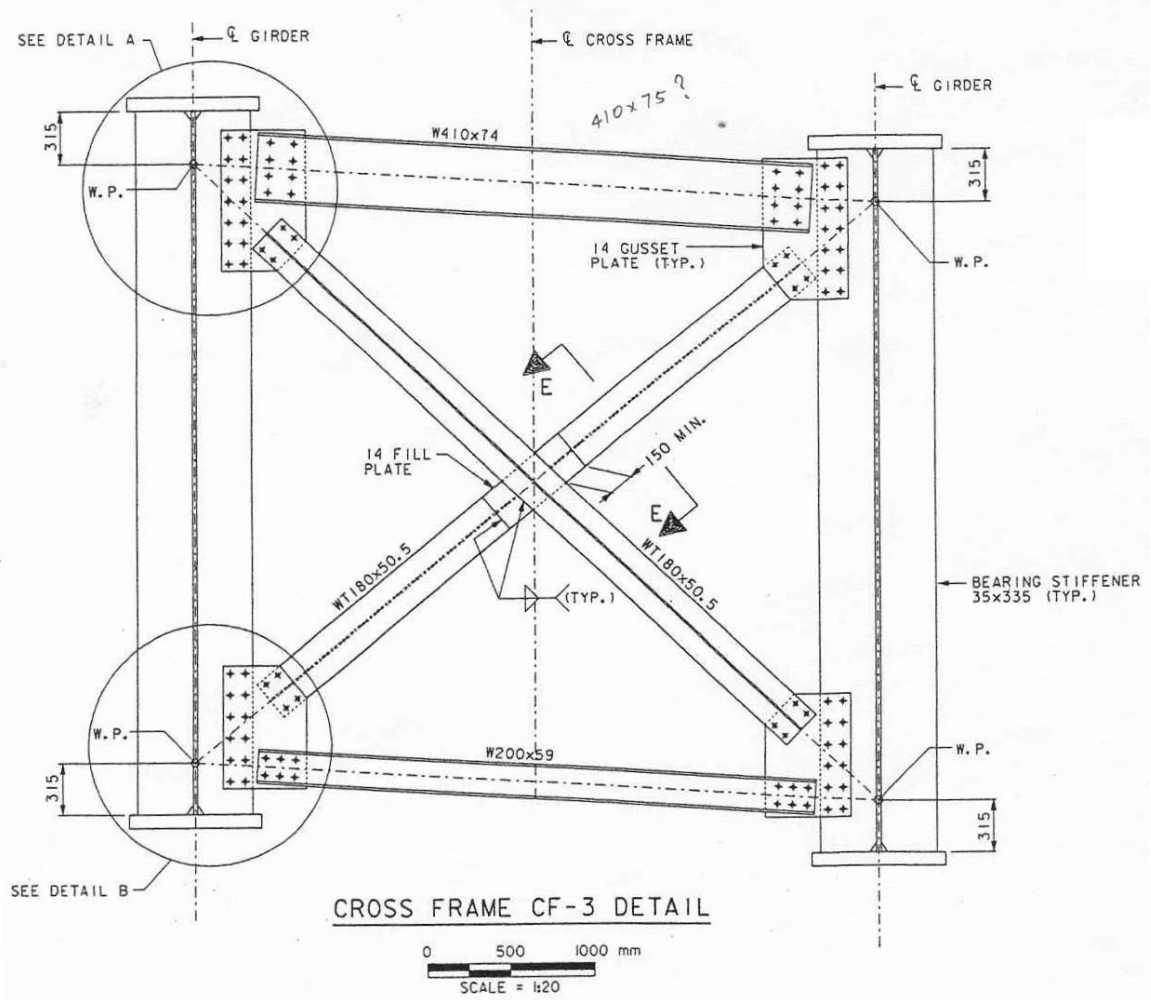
The Ford City Bridge cross-frame CF-1 detail, all dimensions in mm
